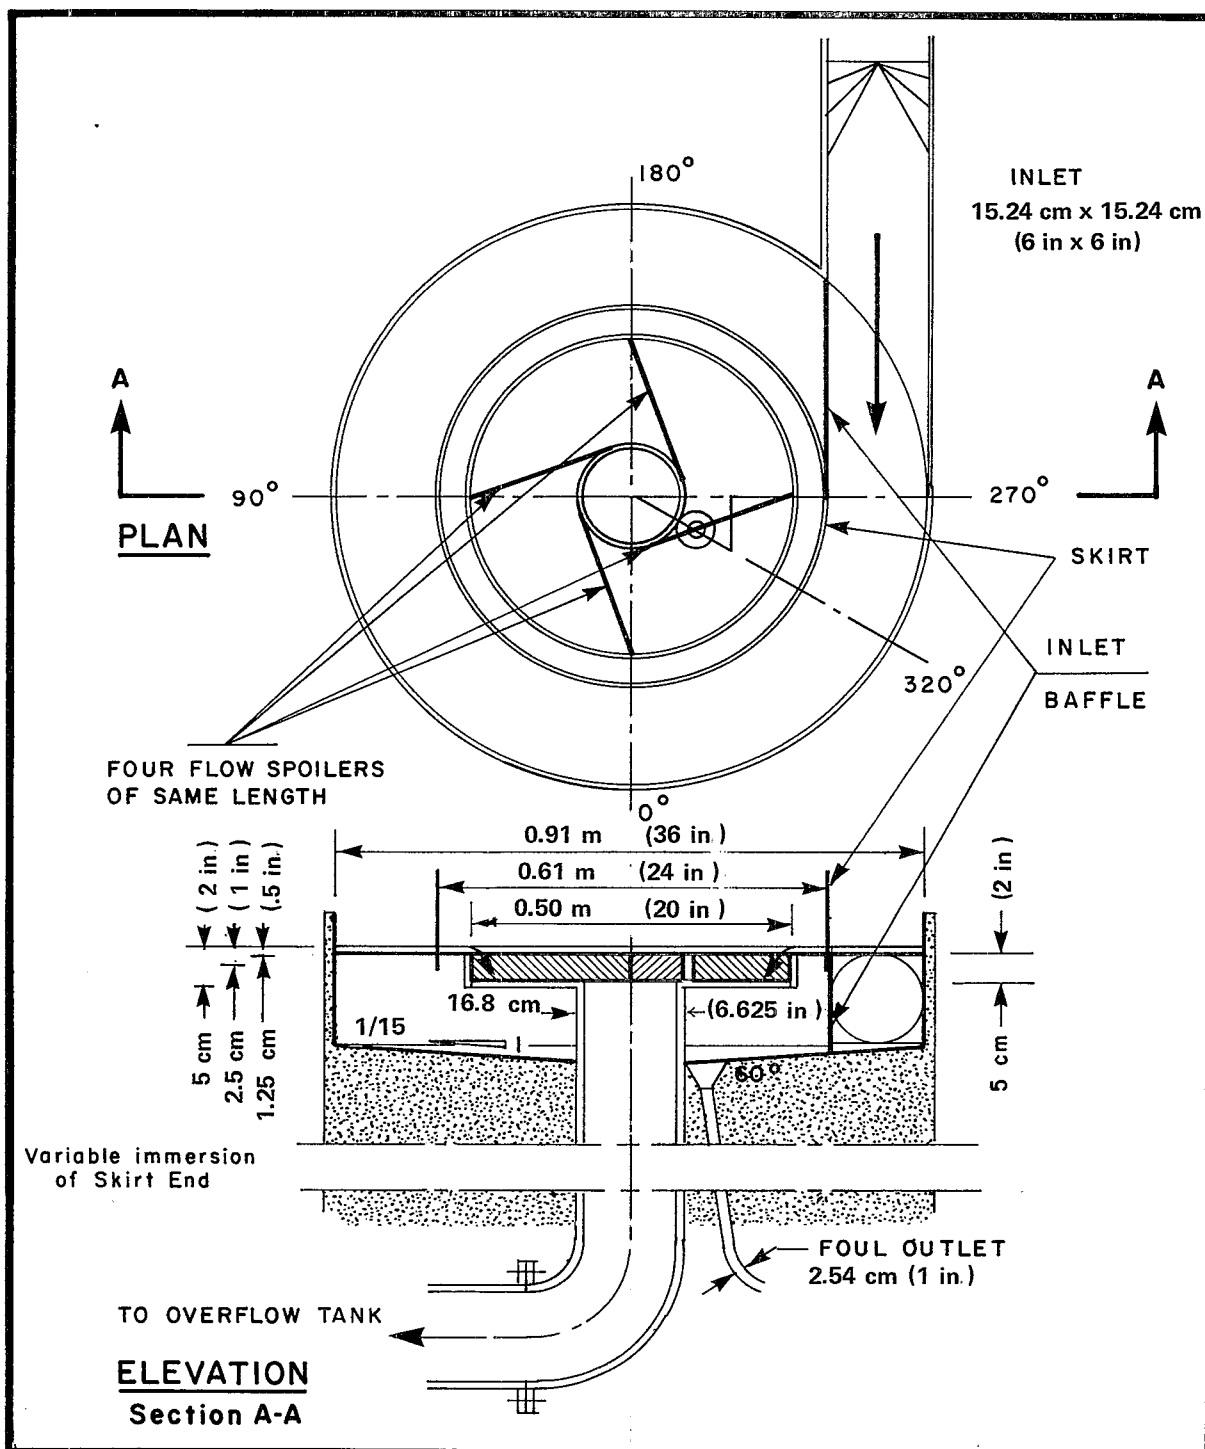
MODEL LAYOUT FOR TESTS 23 to 31
